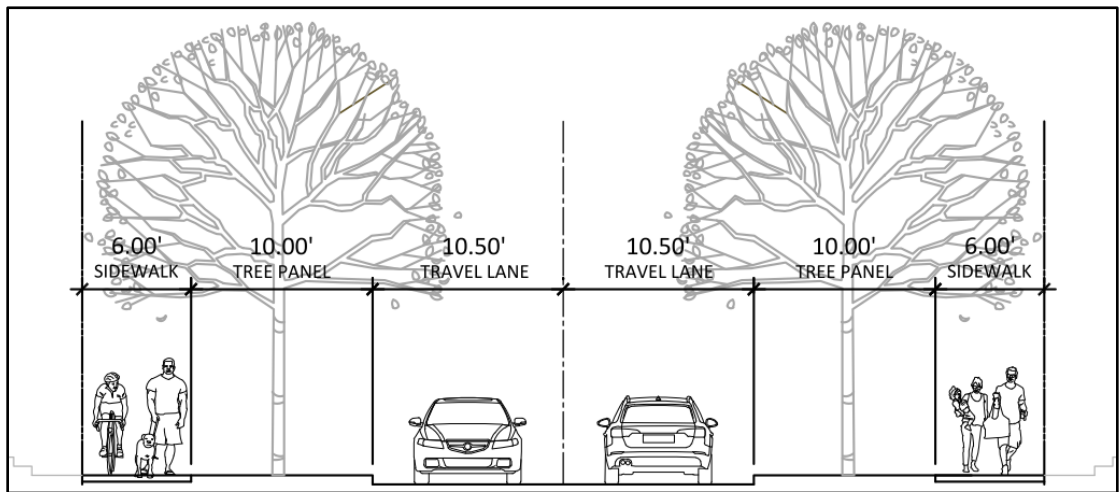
Proposed Cross-Section for Street B, as conditioned.
